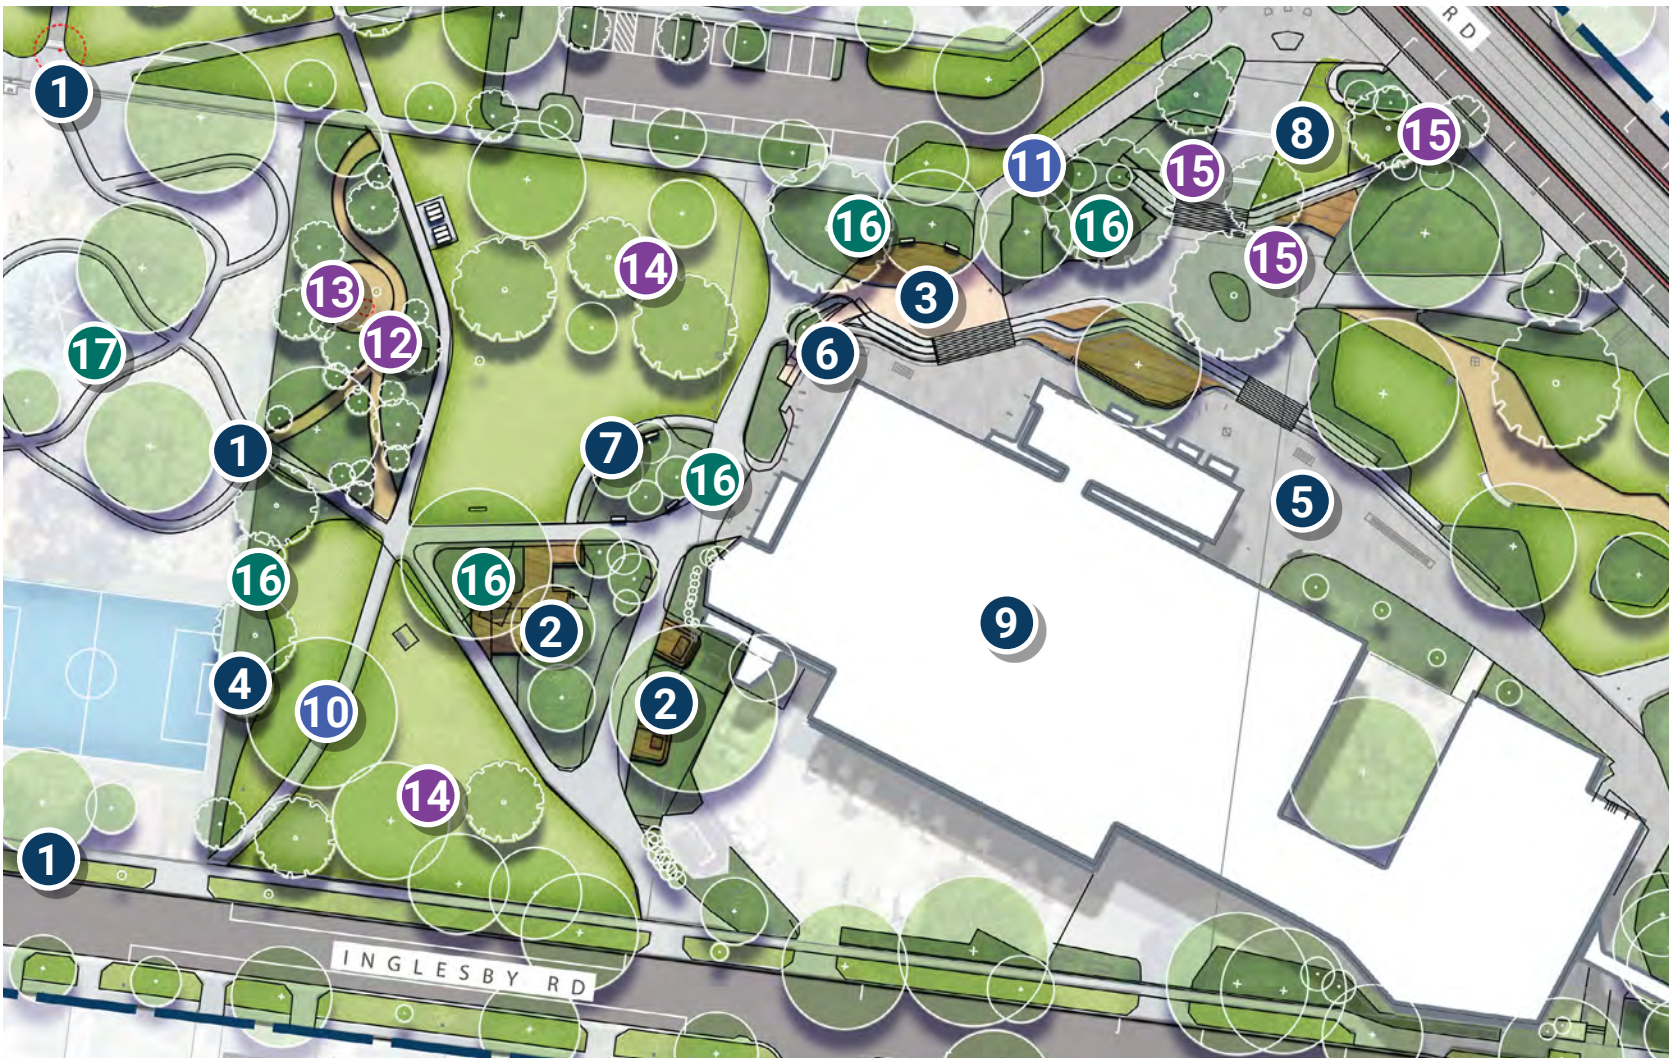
Master plan recommendations – Boroondara Civic Precinct.
